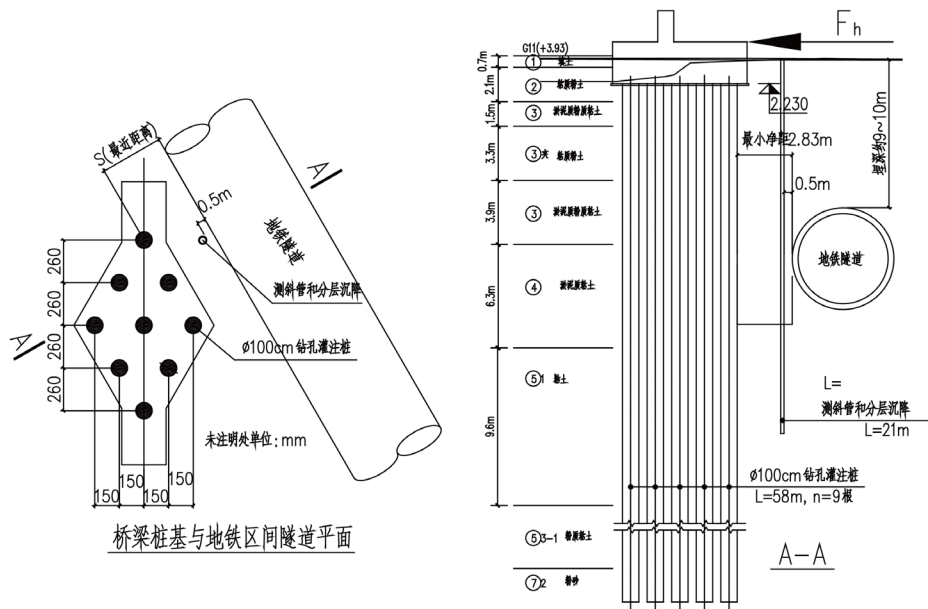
Layout of the inclinometer tube near the main pier of crossing bridge
